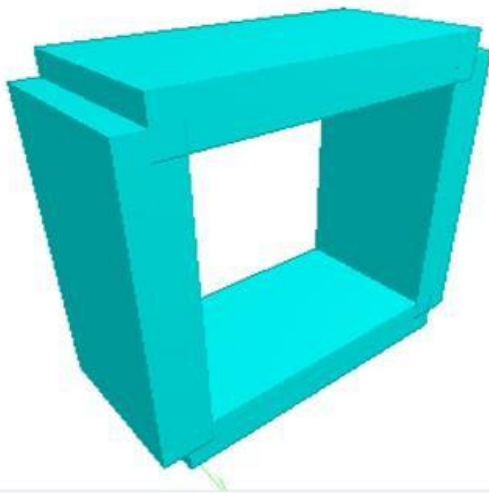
3D model of box culvert in Staad Pro Earth pressure
